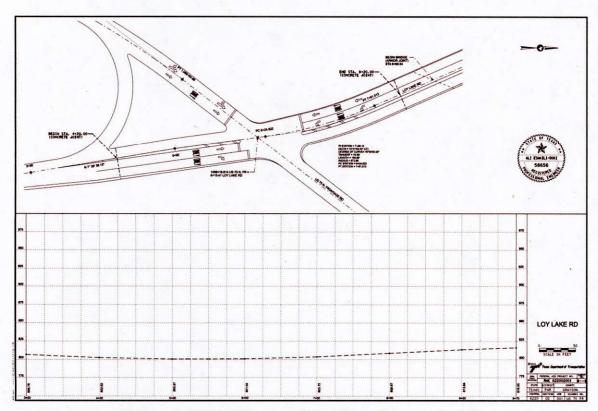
Plan View and Elevation of Loy Lake Rd
